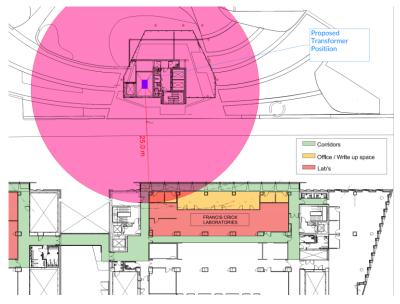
Location of proposed UKPN Sub-statin at Brill Place
